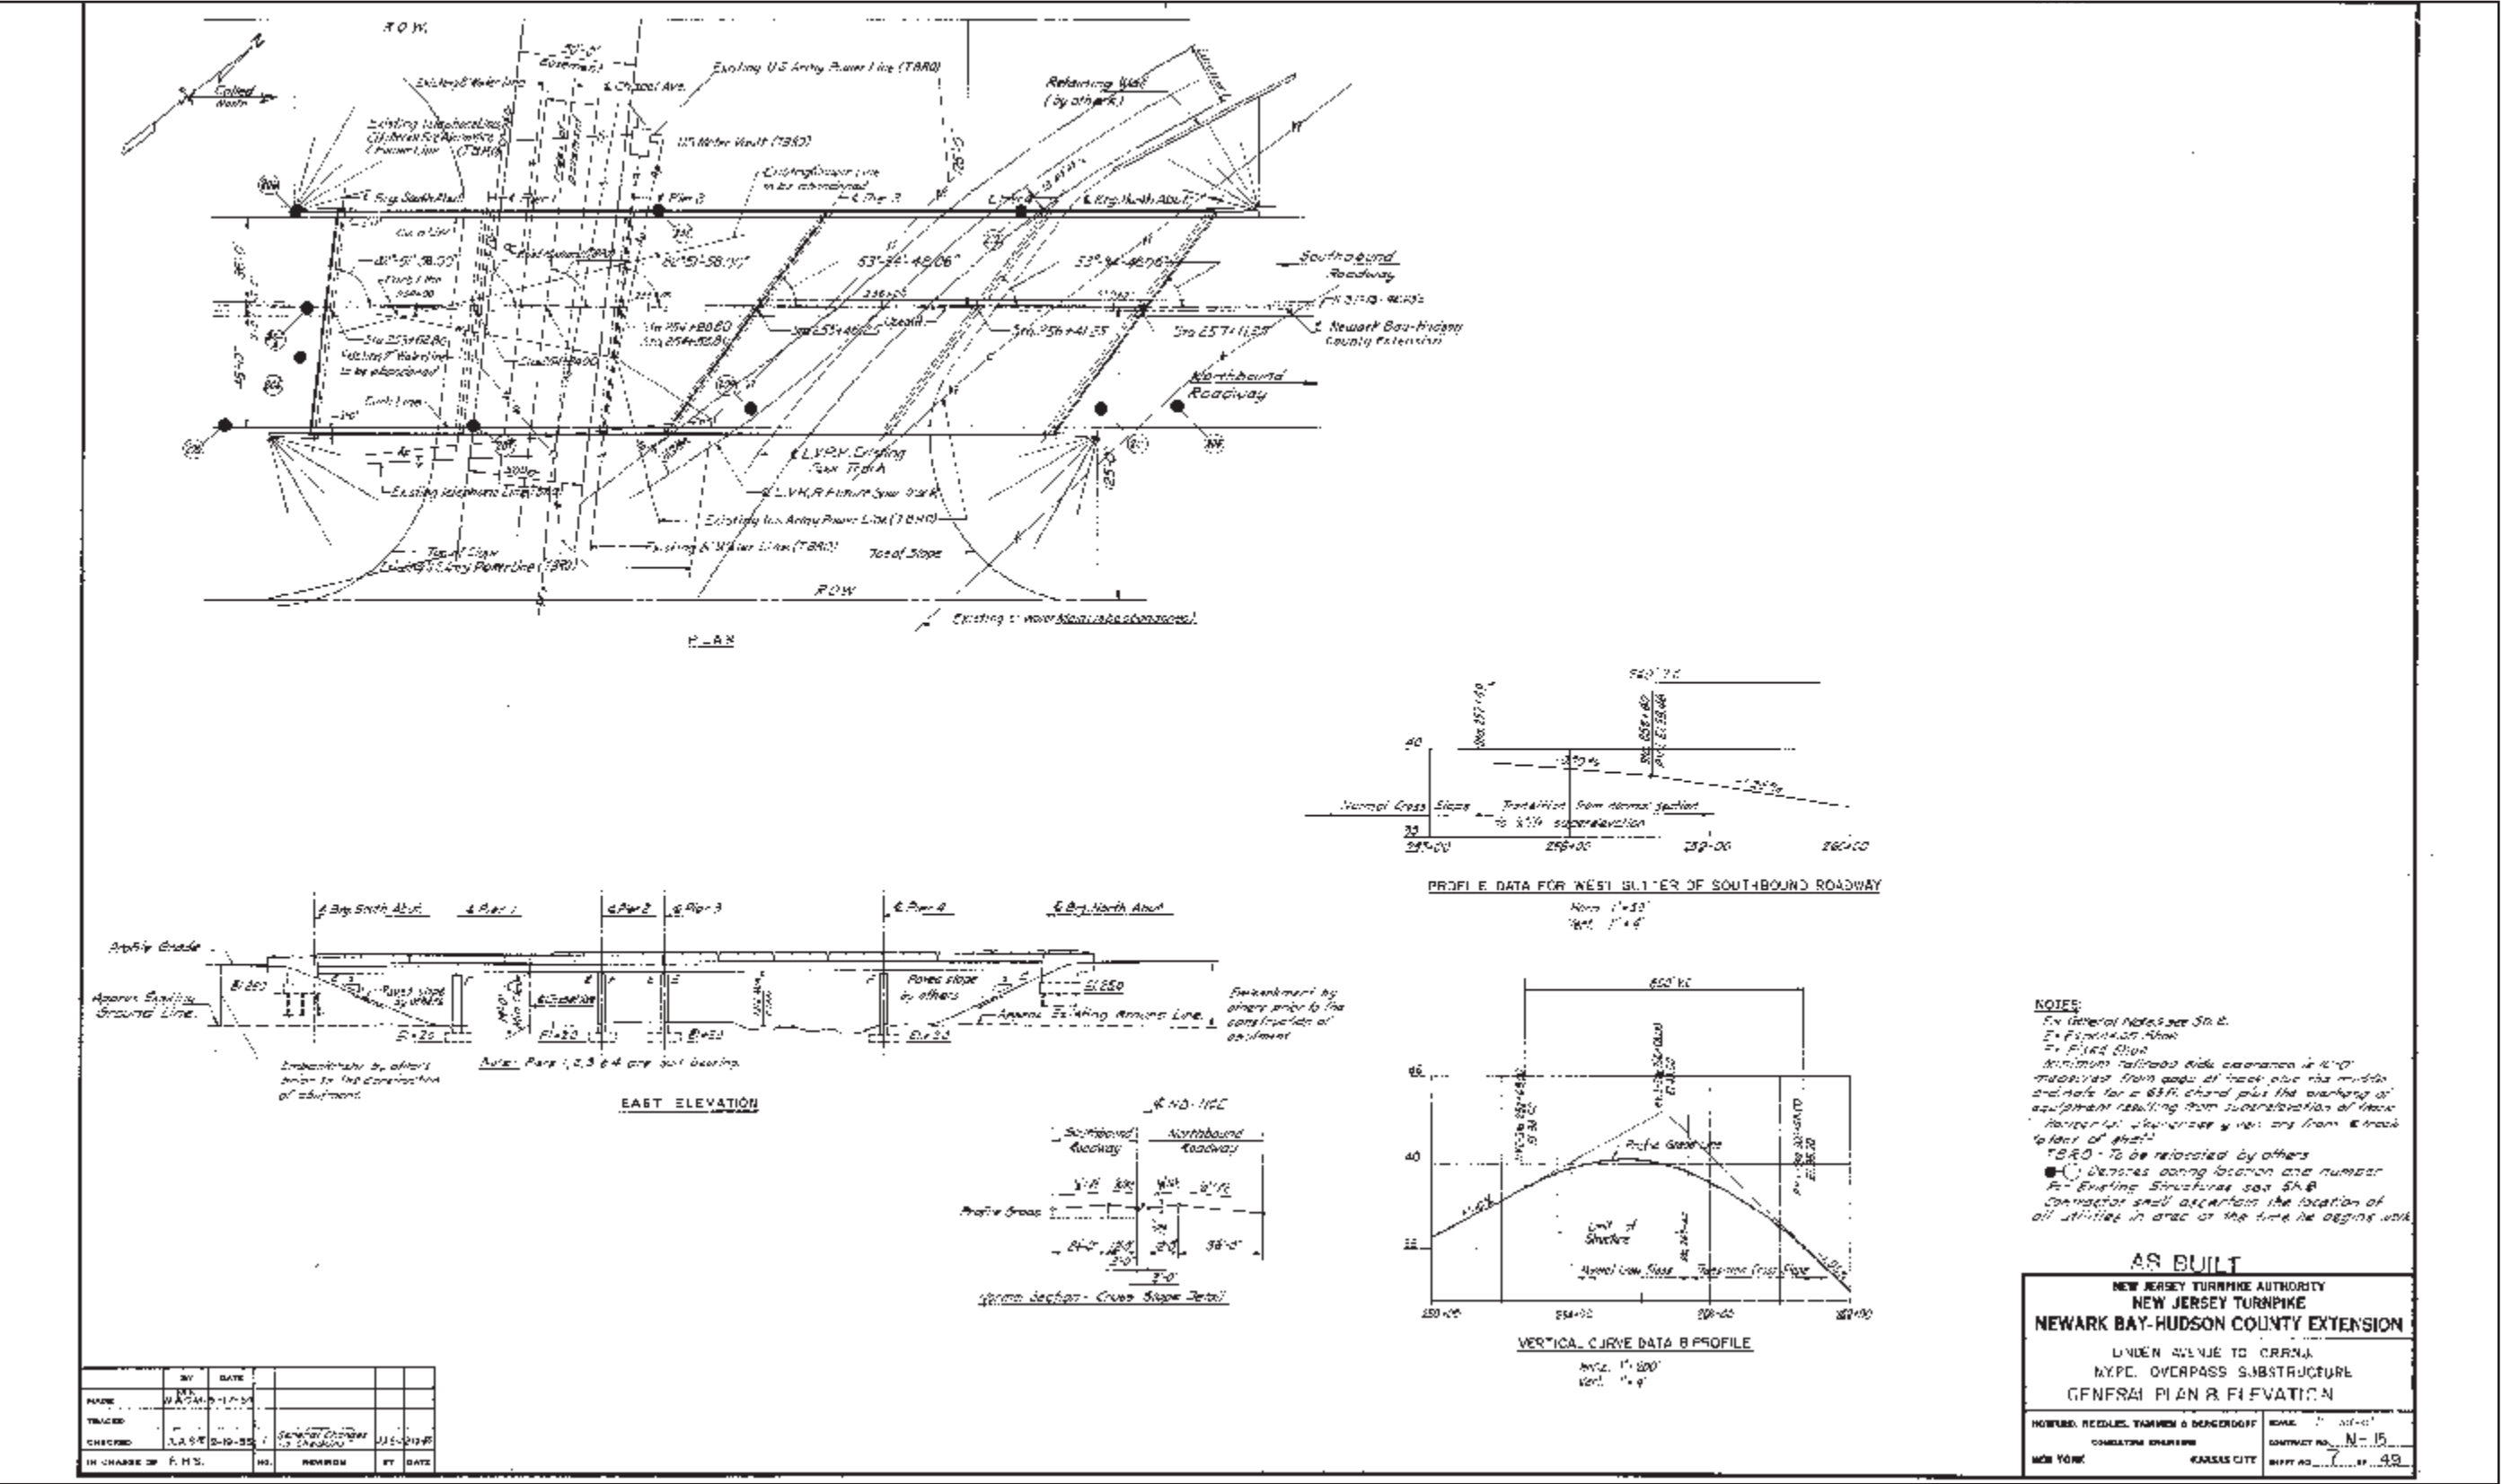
1955 construction drawing showing the general plan and elevation of the Southeast Viaduct (HNTB 1955d).
